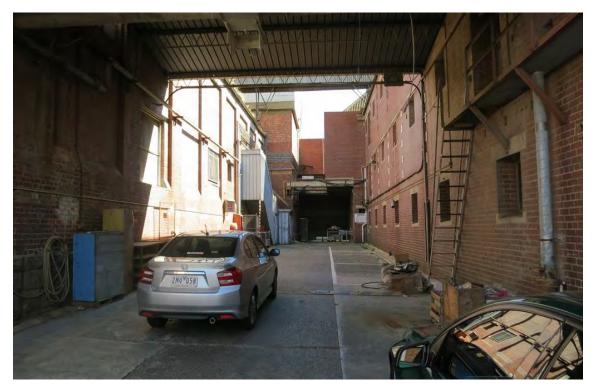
Laneway on north of site, with B4 at right and B5 at left
